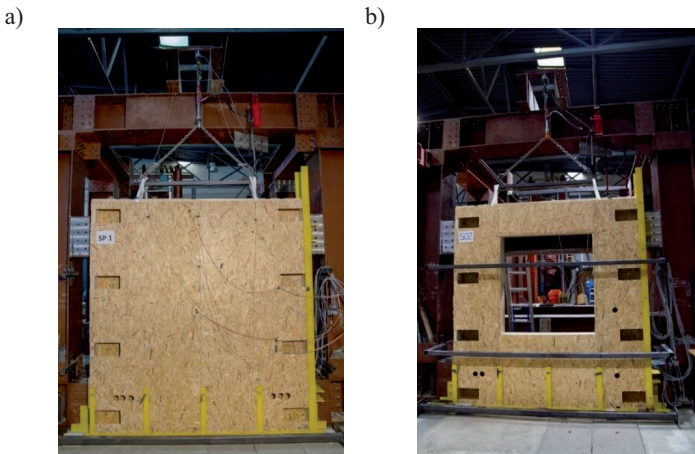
Walls and testing stand up: a) full wall, b) wall with opening
